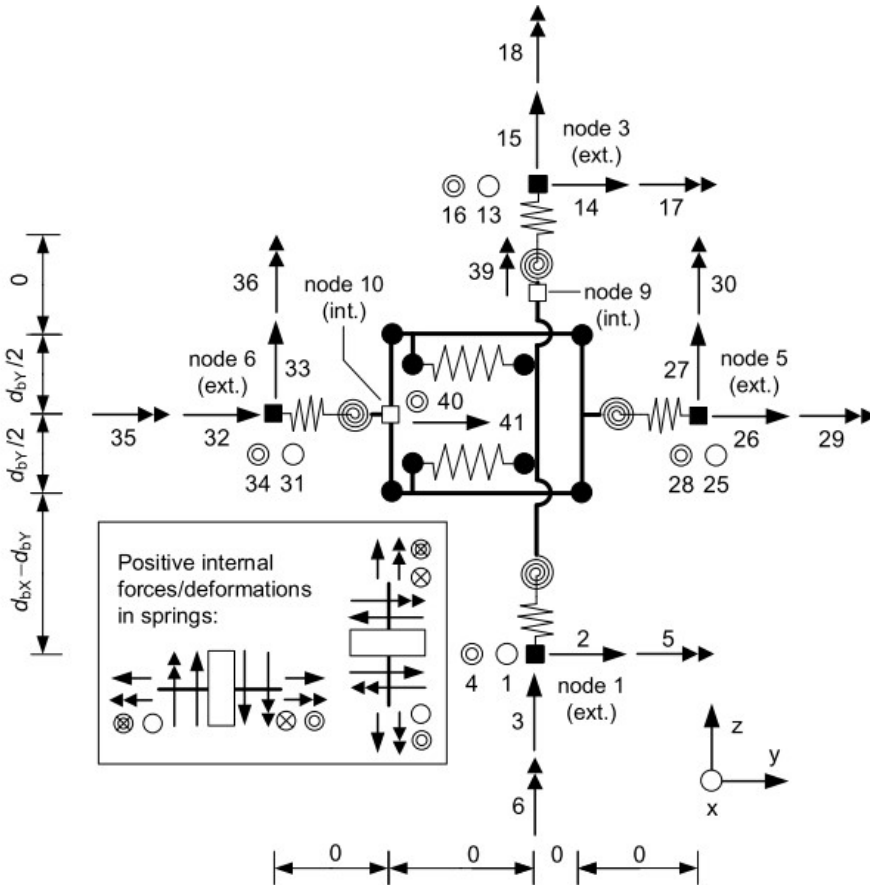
Macro-element for beam-to-column steel joints in 3D: Y-Z plane [149].
